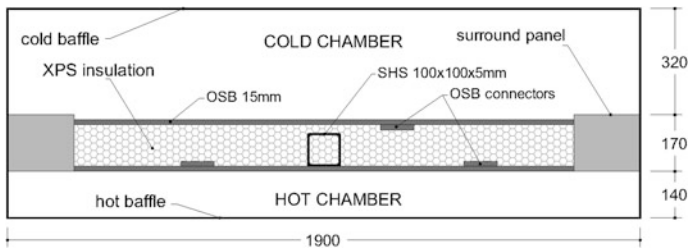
Cross-section of tested specimen, inserted in hot box (dimensions in mm)
